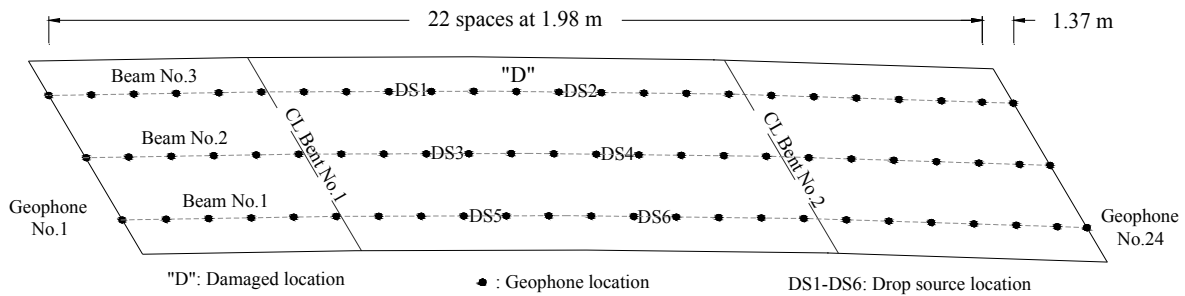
Plan view of the entrance ramp to James White Parkway
